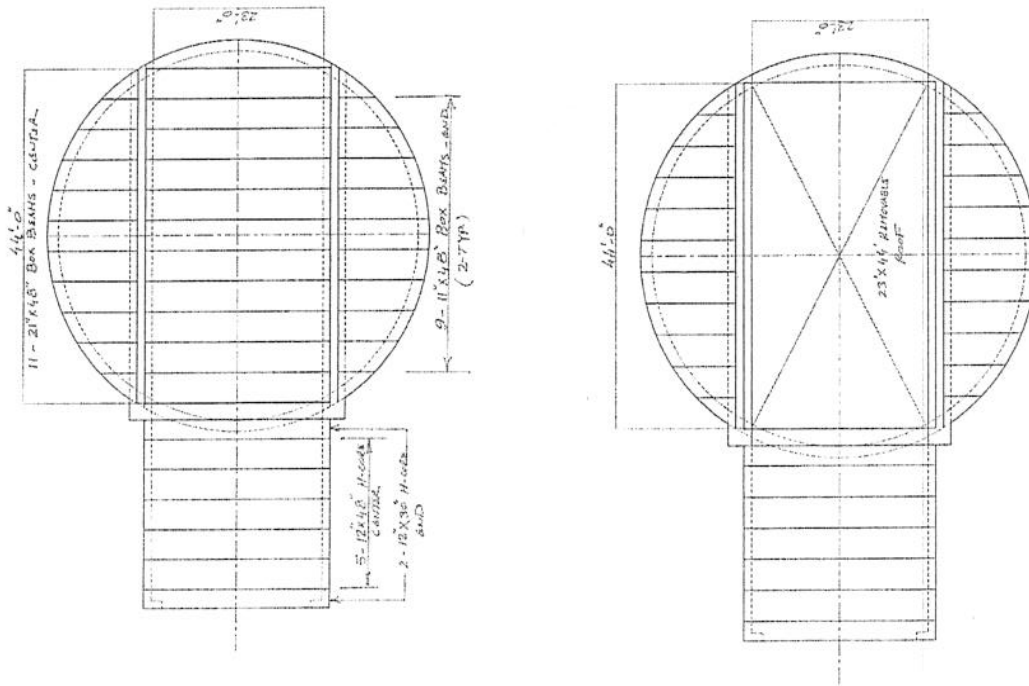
The new roof with the central removable slabs in place (left), and new roof with central slabs removed.
